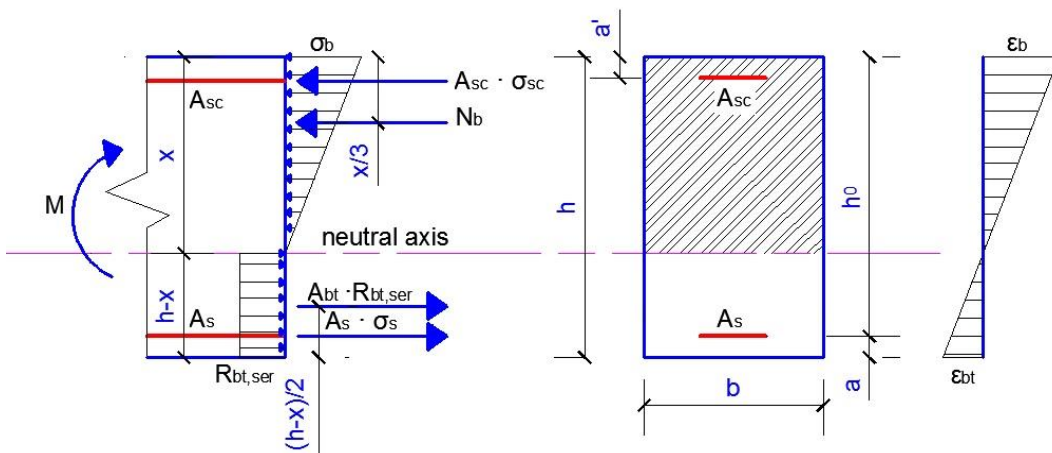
The stressed and deformed state of a reinforced concrete element in bending, with rectangular cross – section
